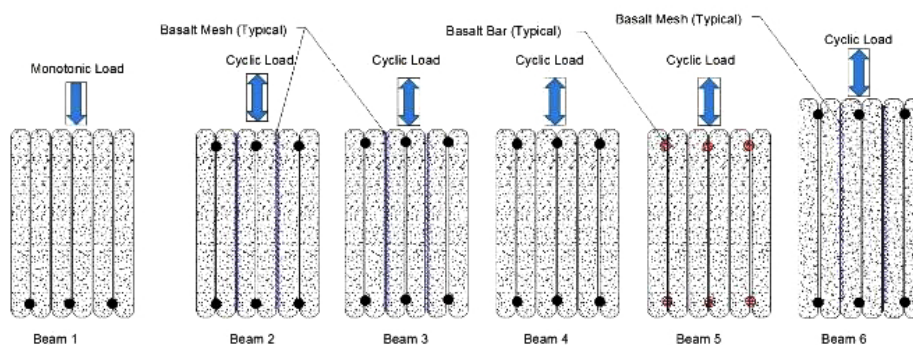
Schematic beam cross sections detailing reinforcement types and configurations.
